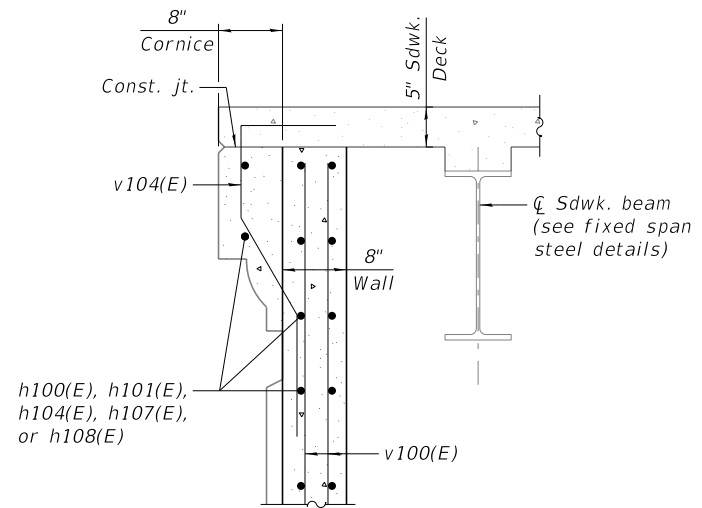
TOP - SW ENCLOSURE WALL
